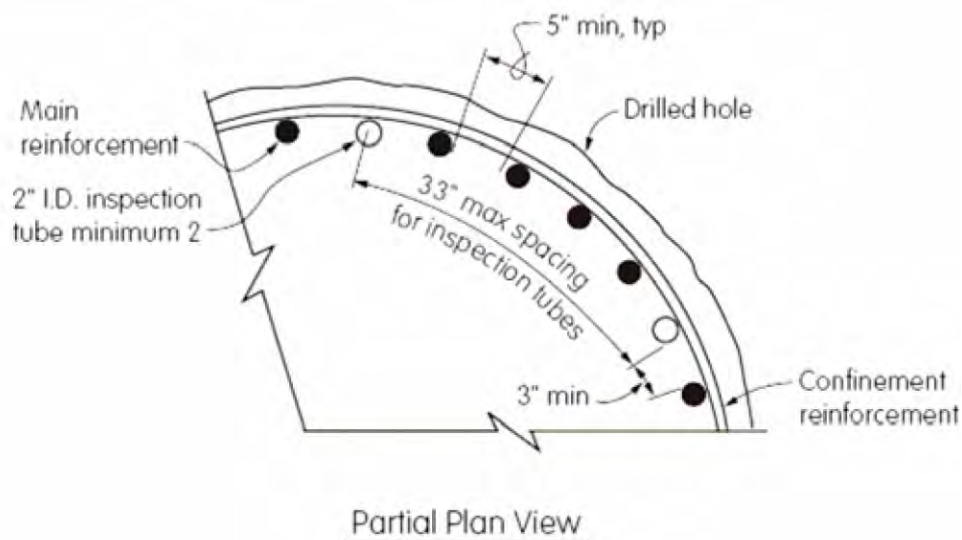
Spacing Requirements for Longitudinal Reinforcement and Inspection Access Tubing in Drilled Shafts (Caltrans, 2008)
